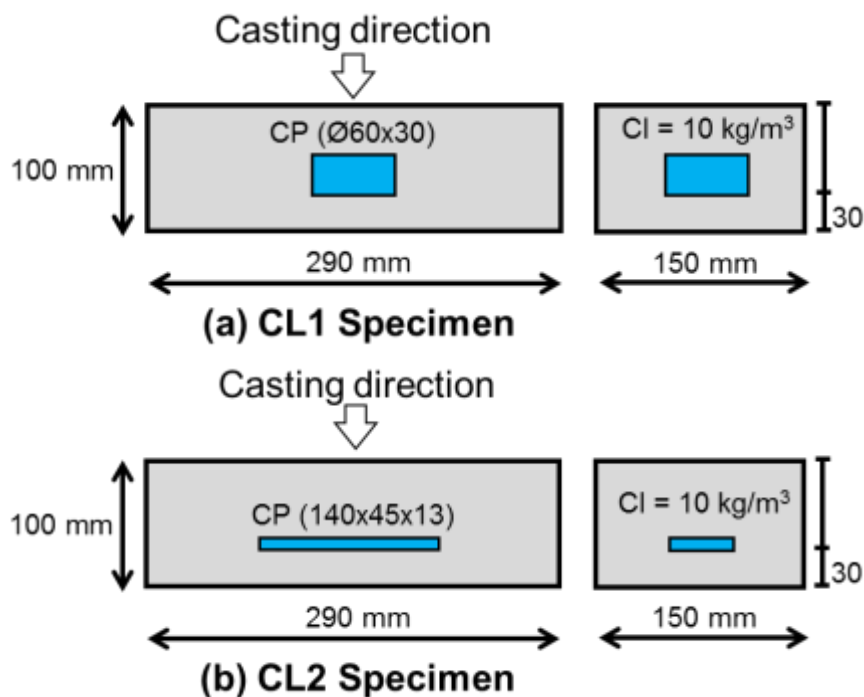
Detailed layout of concrete specimens with zinc sacrificial anode only embedded in concrete
